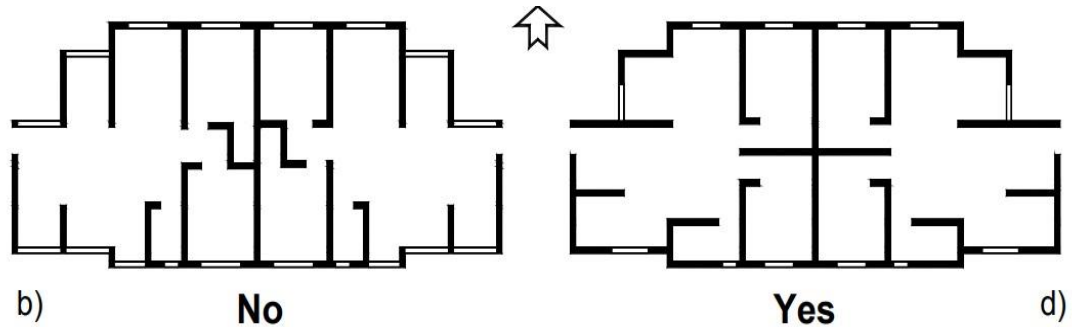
Wall distribution in plan: (b) not enough wall in E-W direction & (d) adequate wall in both direction (*Tomazevic et al, 2011*).
